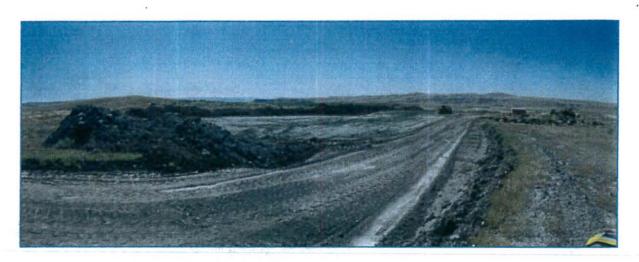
(above) looks generally south and shows the bentonite drying pad area on the east side of the Access Road. On the west side of the access road a motor grader, Terex scraper, and a Cat D9 dozer were parked in an established staging area that was equipped with a fuel supply tank. Photo 8 (below) looks south at an area, located just south of the active pit, where some soil salvage had occurred. It is unknown if salvage operations in the area have been thought to be complete, some soil was still visible at this location.
